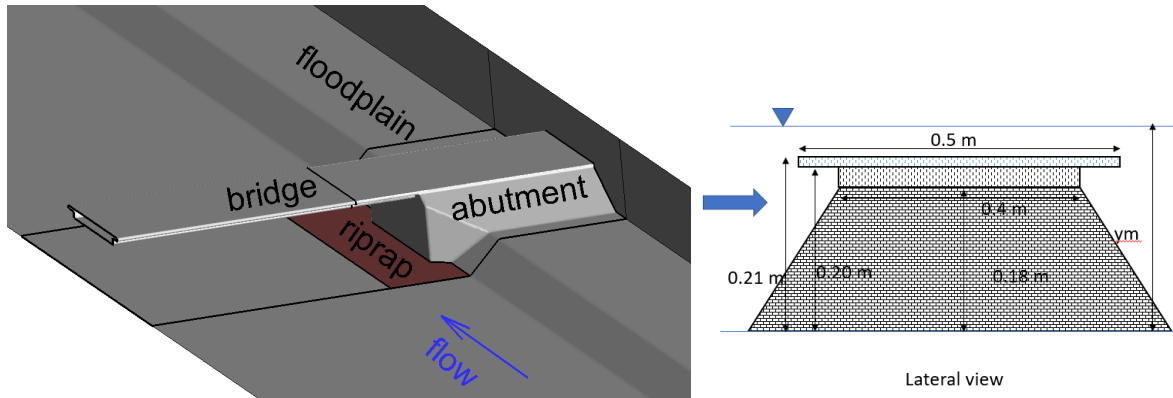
Sketch showing computational domain containing the wing-wall abutment and cross section cutting through the abutment and the bridge deck.
